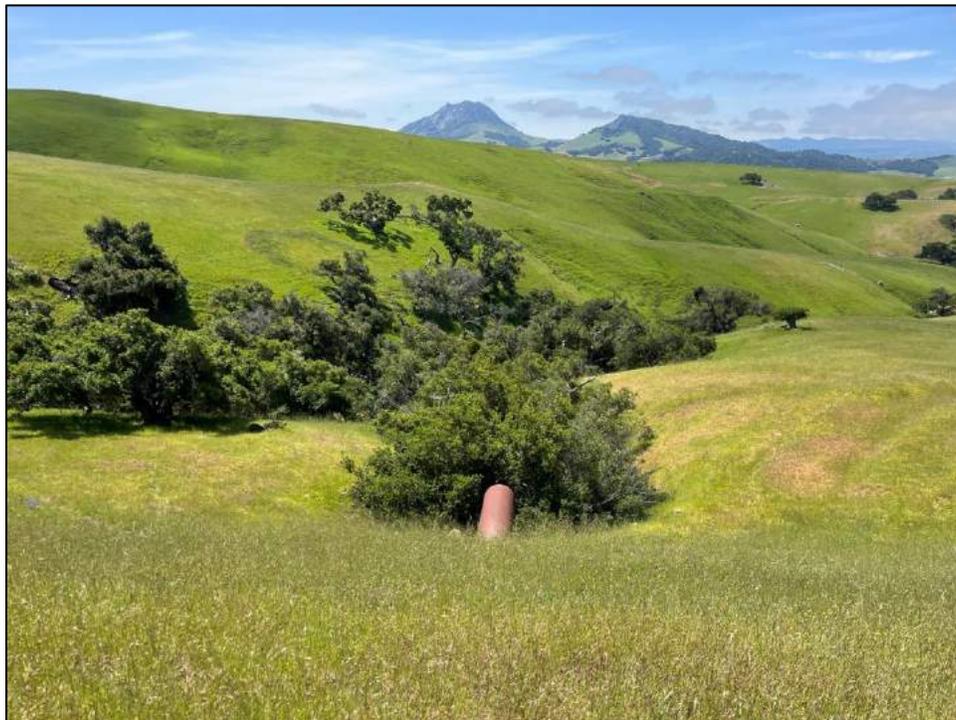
View looking south towards outlet of Culvert E and Drainage 10 with coast live oak woodland in background. Photo taken April 28, 2023.
